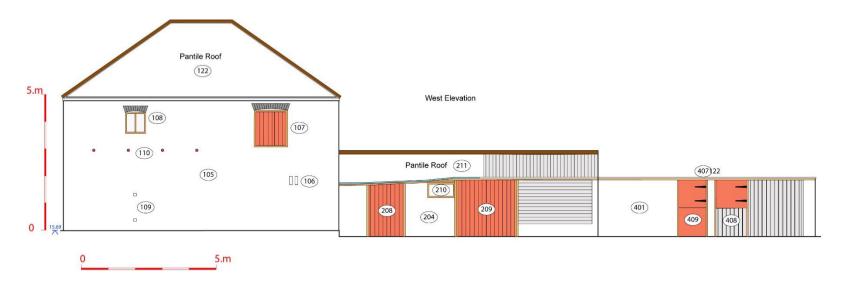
West elevation of the combination Barn, Multi Bay Multi Bay Shelter Shed and Loose Boxes.
